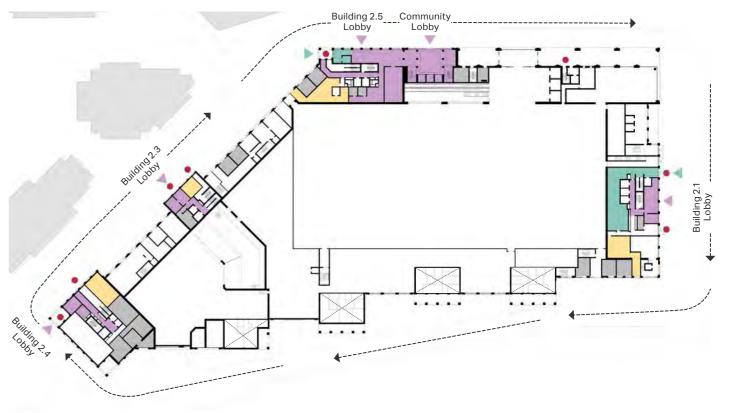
Plot 2 - Ground floor access, entrances, servicing, refuse and cycles
